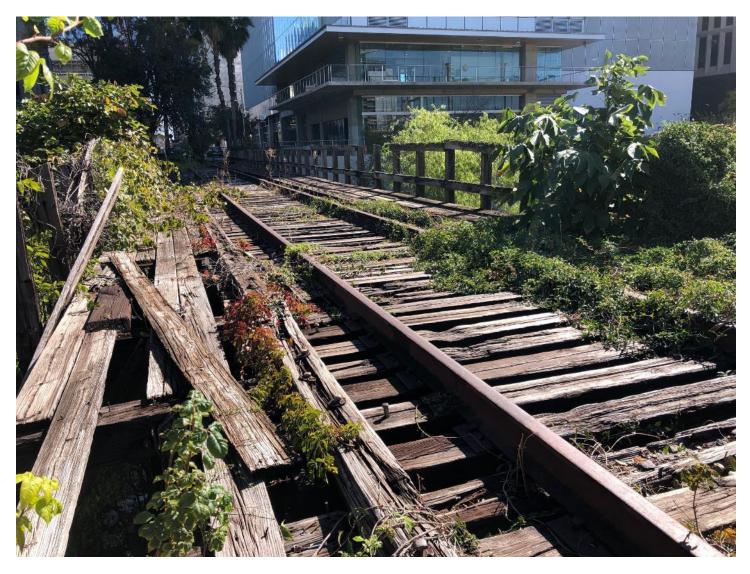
View of north side of Third Street Railroad Trestle, camera facing southeast. Photo by Andre Boudreaux.
